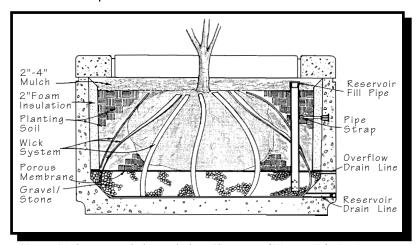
Aboveground planter design. (Courtesy of Wausau Tile, Inc.)
